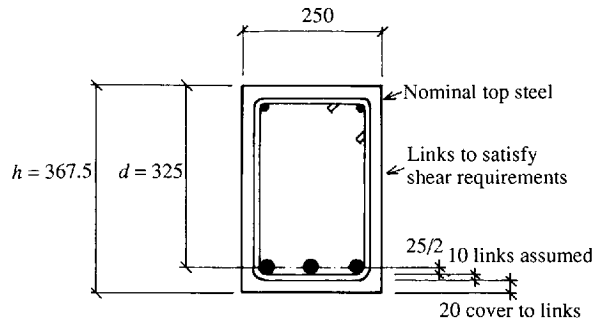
Beam cross-section: grade 35 concrete, HY reinforcement
